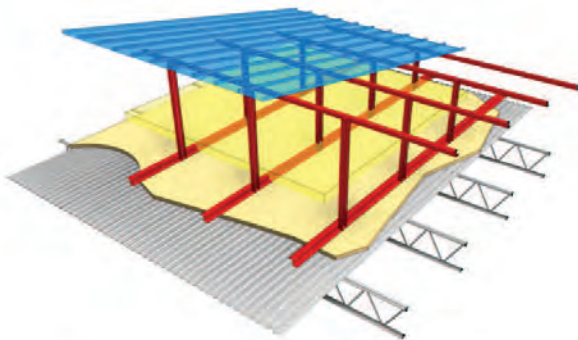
Bar Joist Framed Roof - Perpendicular Application
